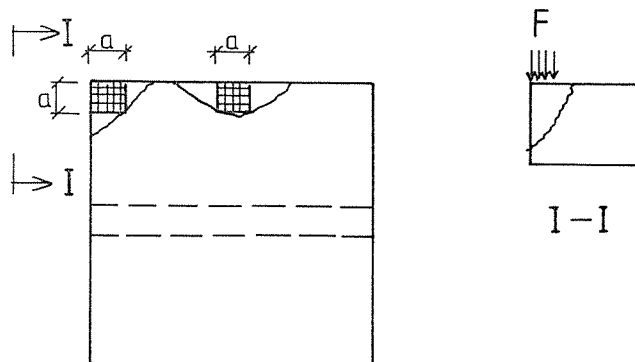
Load tests of a corner and of an edge carried out on a foundation slab.
